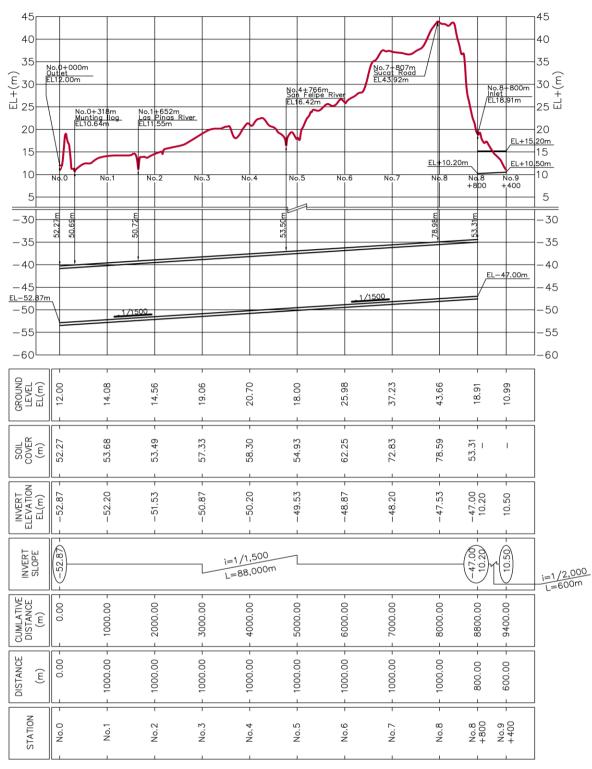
Longitudinal Profile of Parañaque Spillway
